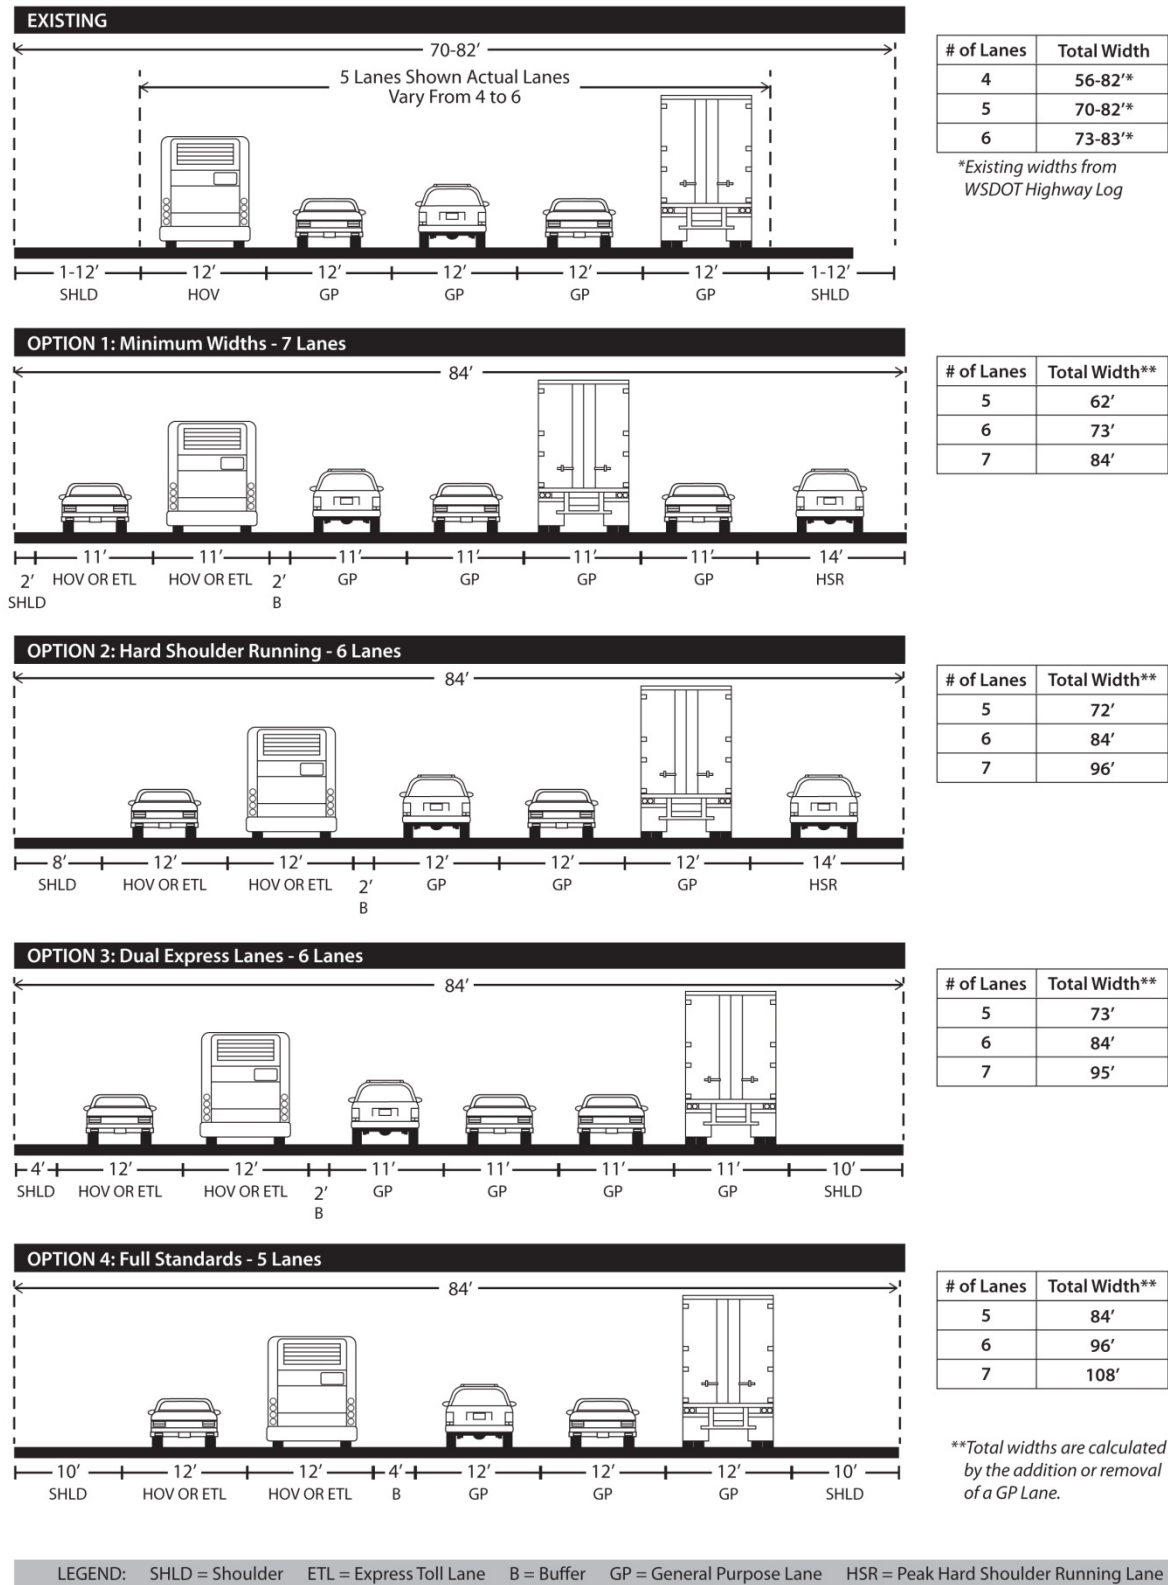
Future Potential Northbound I-5 Roadway Cross Sections
